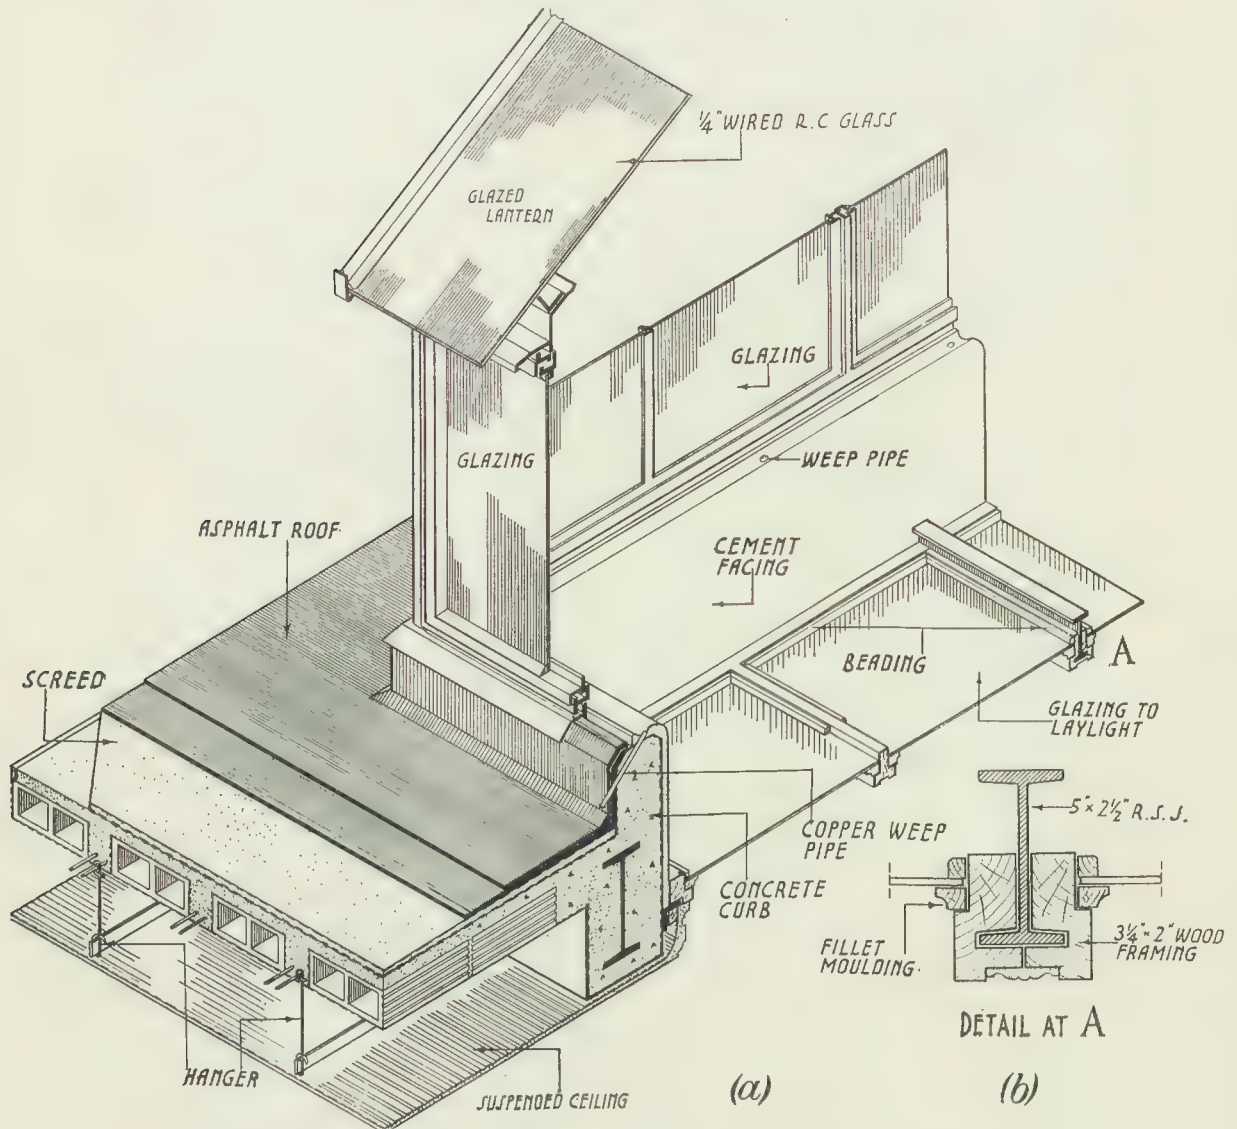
DETAILS SHOWING CONSTRUCTION OF METAL FRAME LANTERN LIGHT
